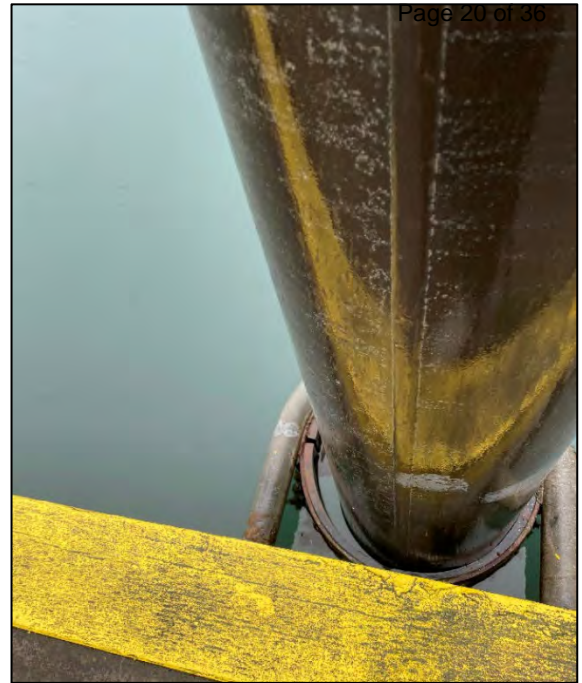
Typical steel pile and exterior pile hoop. Note galvanized pile coating is consumed
